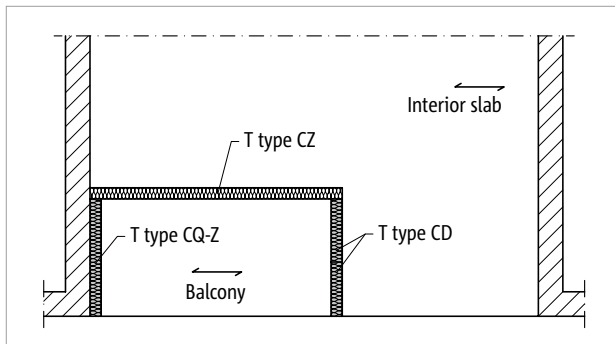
Schöck Isokorb® T Type CD, CQ-Z; Z: One-way spanning
